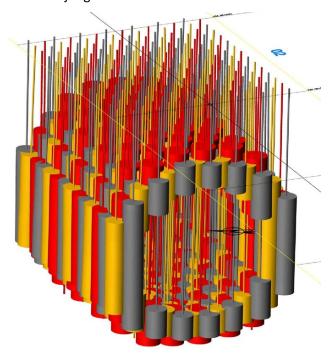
Model of a tunnel lining consisting of jet grouted columns
